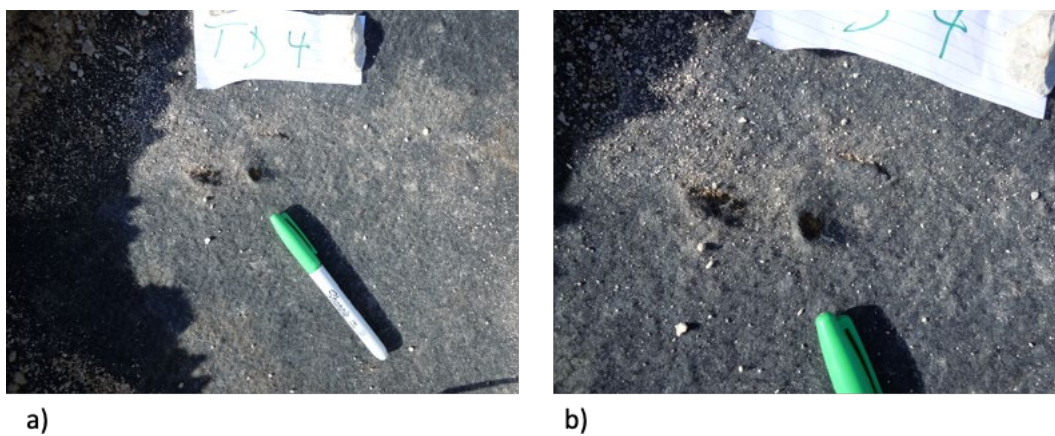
(a–b) Damage of geotextile at location of cyclic test on cement-treated strip.
